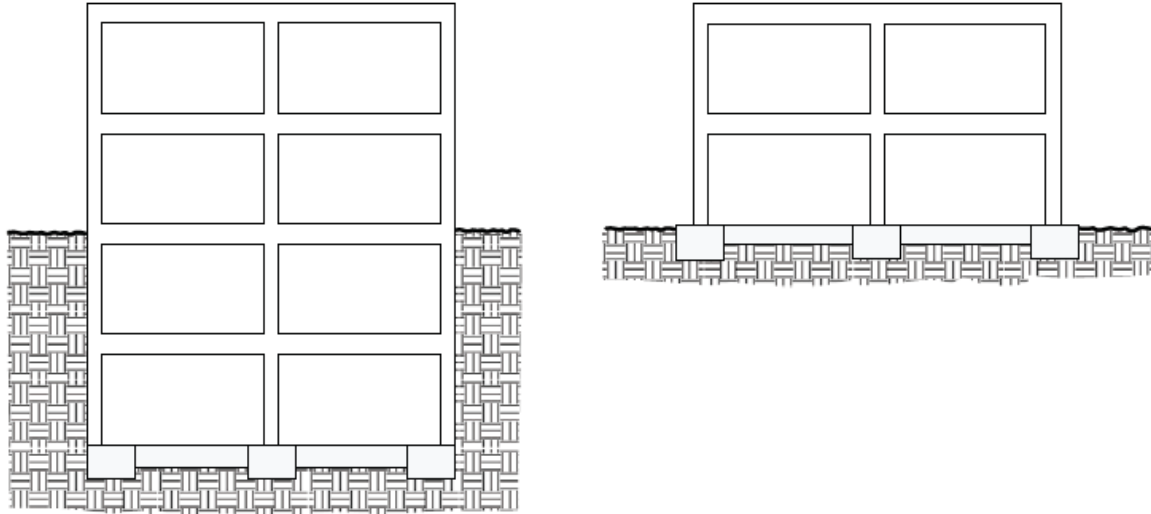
Foundation embedment example (FEMA, 2020).
